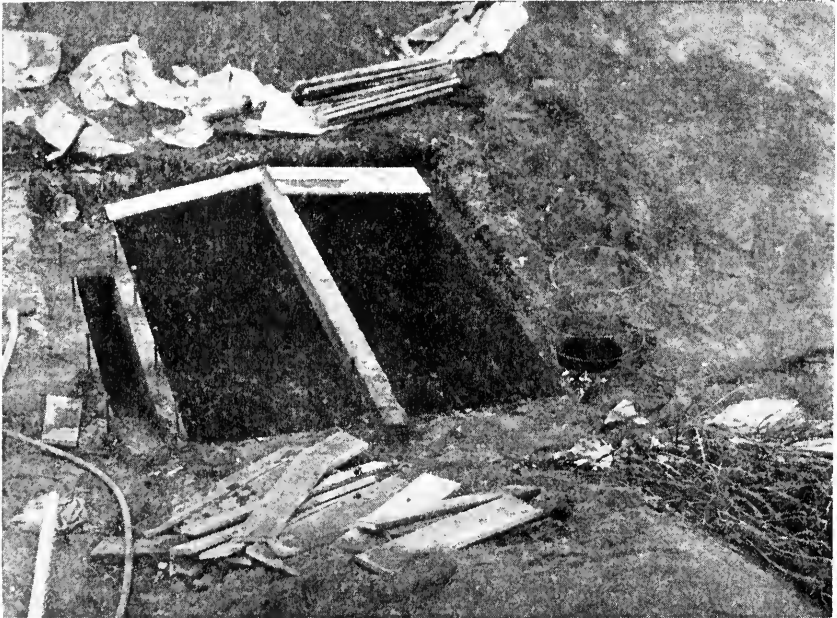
Box Springs (southern California quail refuge) installation just after removal of forms. Bolts have been set in the concrete surrounding the trough to hold coyote guard and shade. The form for the concrete roof is being installed. The manhole will be in upper left corner of the tank, and a wash-tub will serve as inside and outside form for hole and cover. Settling basin with screen at lower right corner.
